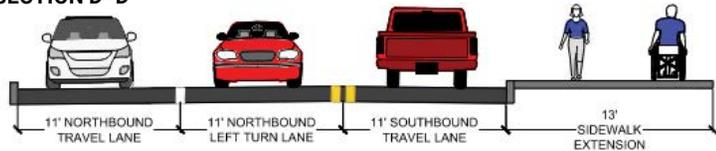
Intersection Concept Plan for Dutton Street at Merrimack Street - Alternative B
